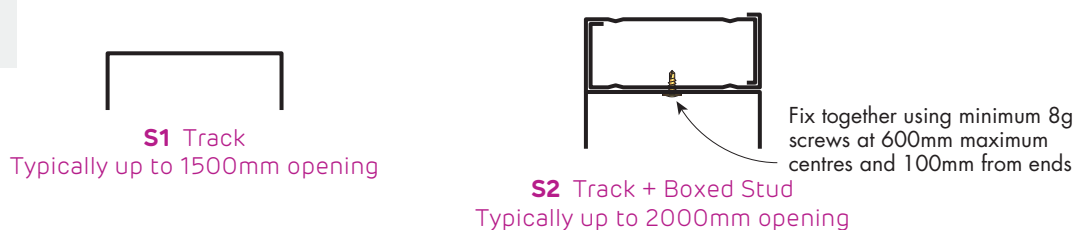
Internal Steel Frame Wall with Window and Door Openings
